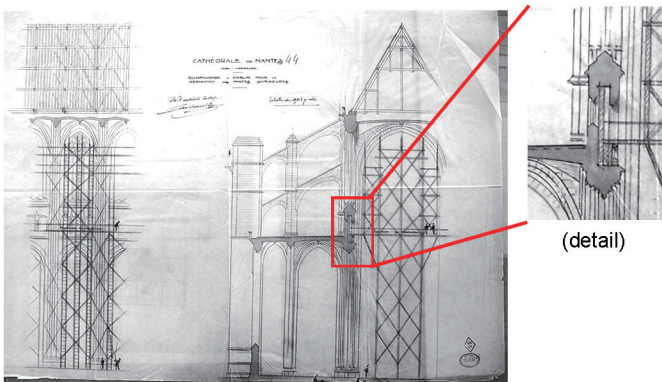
Case No. 7. Nantes Cathedral, elevation (left) and section (right) showing the scaffolding (L. Vincent, 1914)
